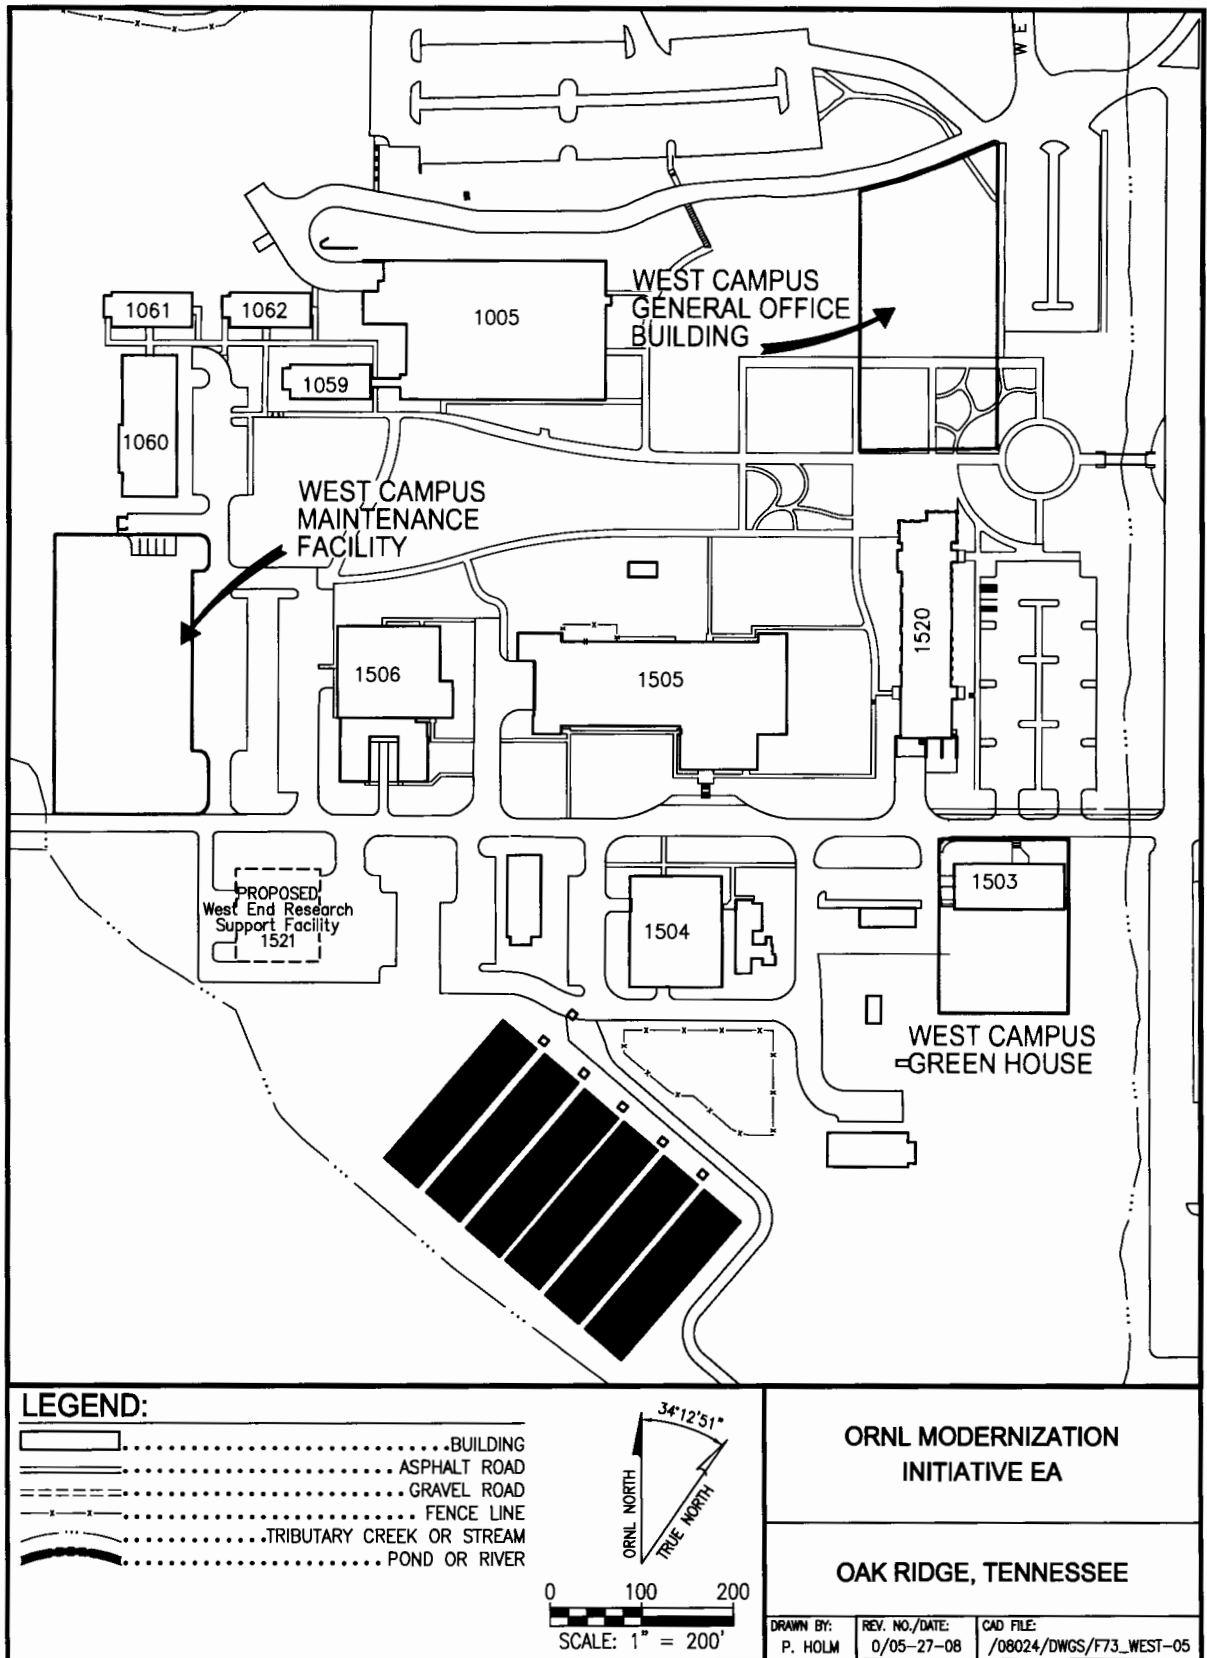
Location of the West Campus Greenhouse, Maintenance Facility, and Office Building.
